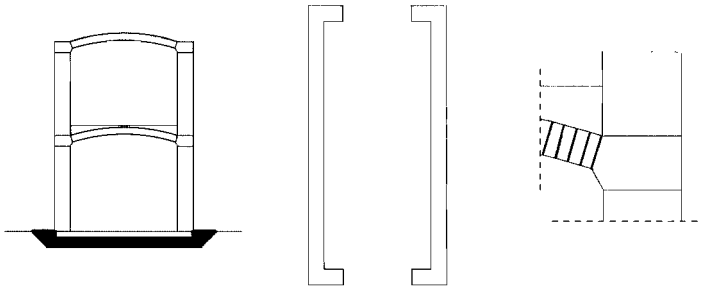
Loam construction, 2 floors - L2, section, floor plan and detail.
